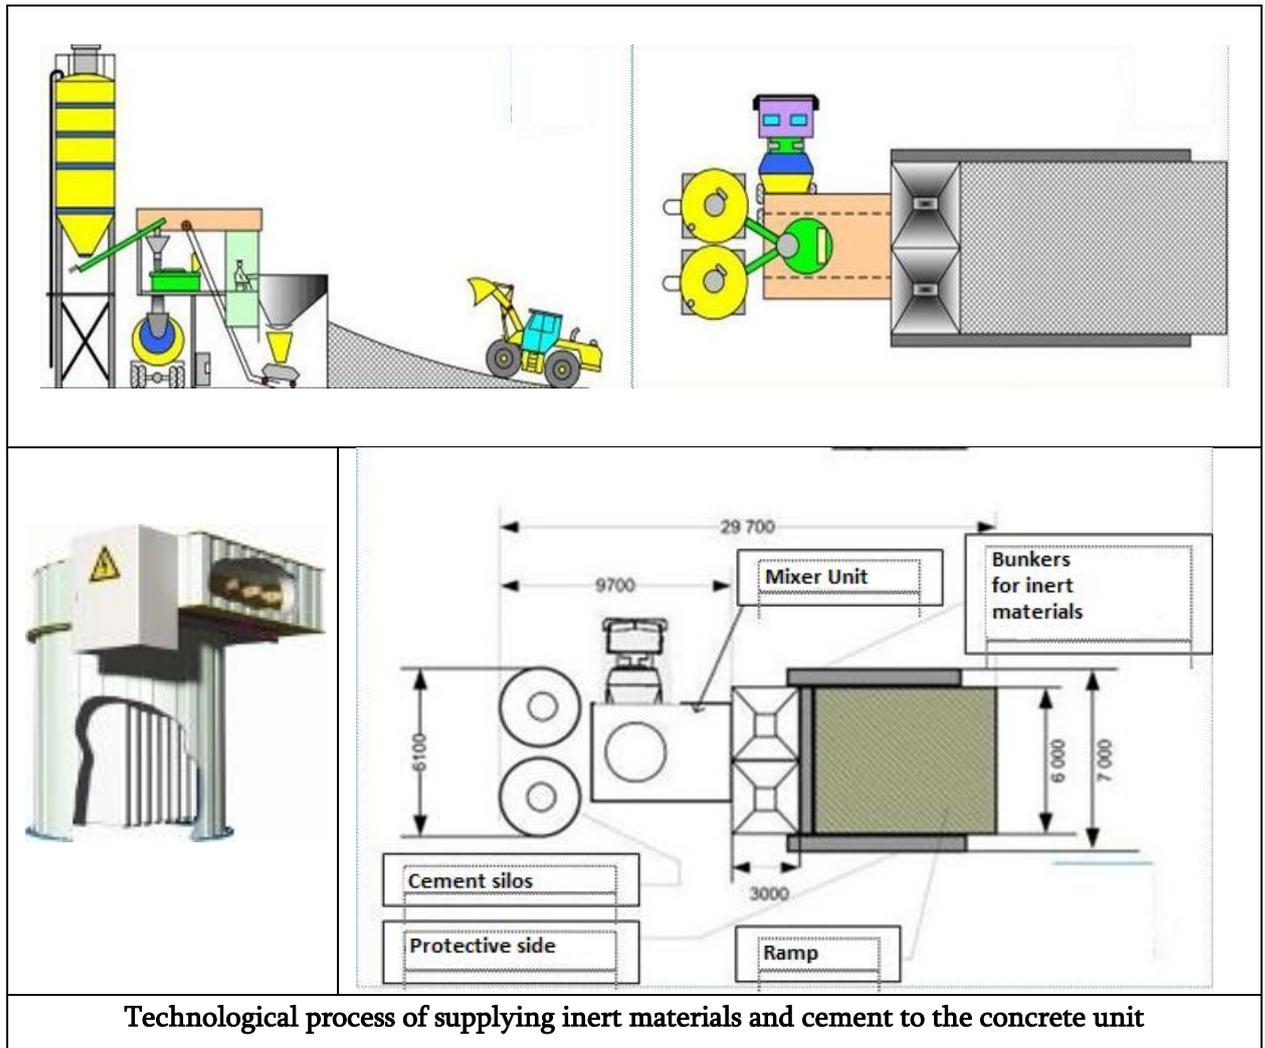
Schematic layout of the mobile concrete batch plant (Source: Universal Company)
